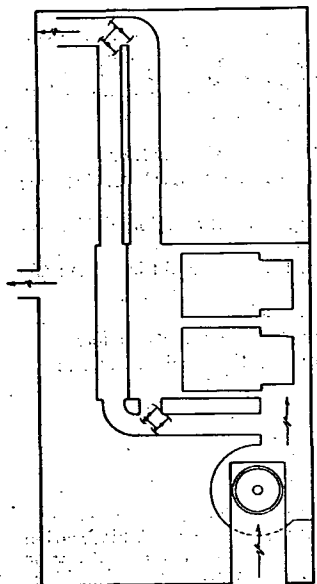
HEATER ARRANGED TO USE OUTSIDE AIR, WITH TEMPERED AIR CHAMBER ABOVE WARM AIR CHAMBER SHOWING DOUBLE DUCT DISTRIBUTING SYSTEM AND MIXING DAMPERS AT BASE OF RISERS
